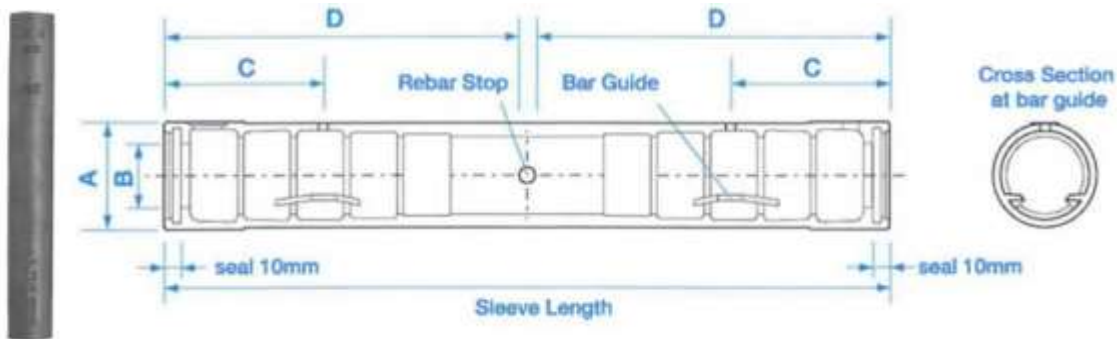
Japan Slim-Sleeve Splice (Splice Sleeve Japan, 2015)
